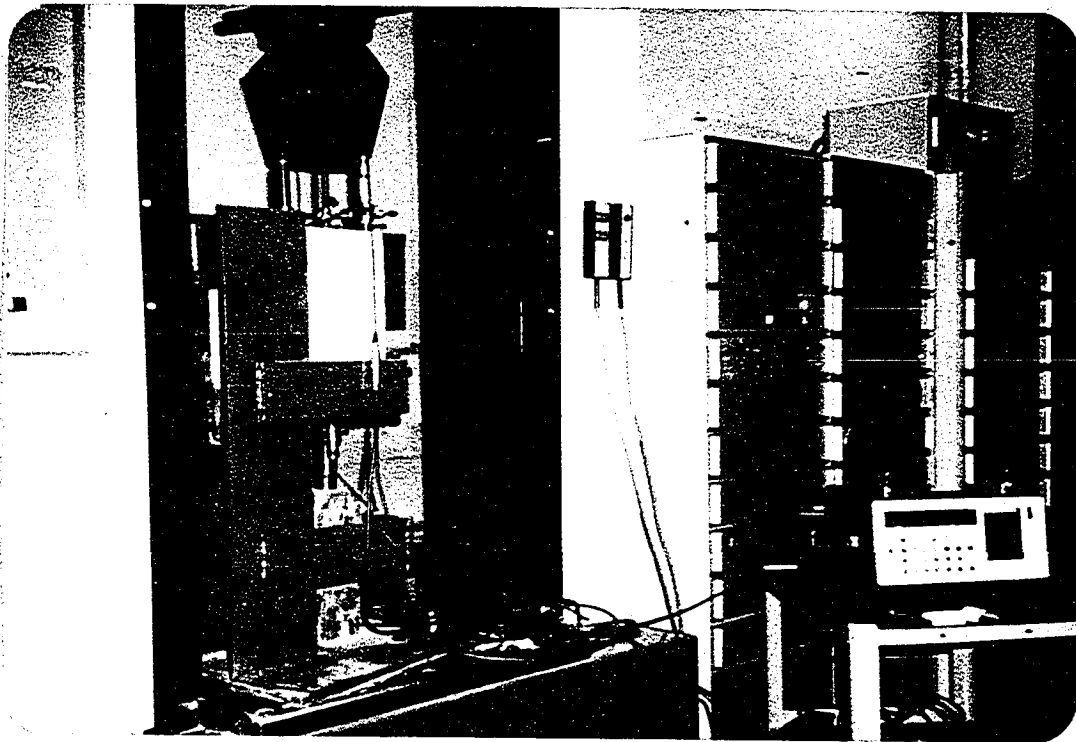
Cantilever Bond Test in Progress with Loading Frame Positioned in the Testing Machine
